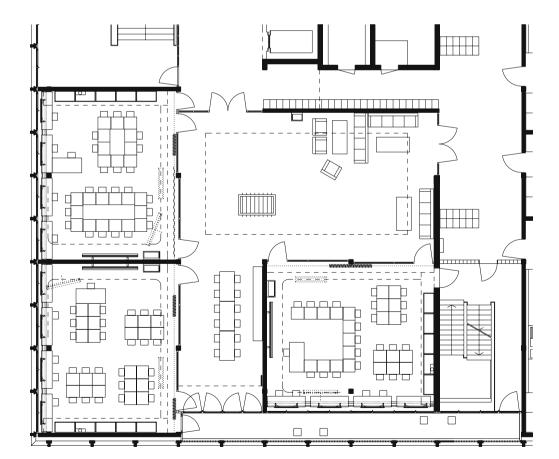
Plan of teaching unit, 1:200 Secondary school
